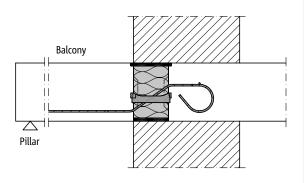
Schöck Isokorb® XT type Q: Connection with single wall, thermally insulating masonry (XT type Q-V1 to V4)
